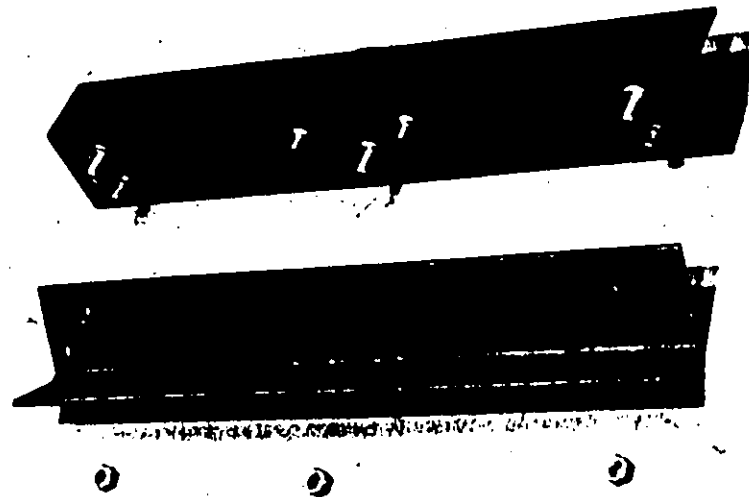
TWO ANGLE SECTION CONNECTION DISASSEMBLED
